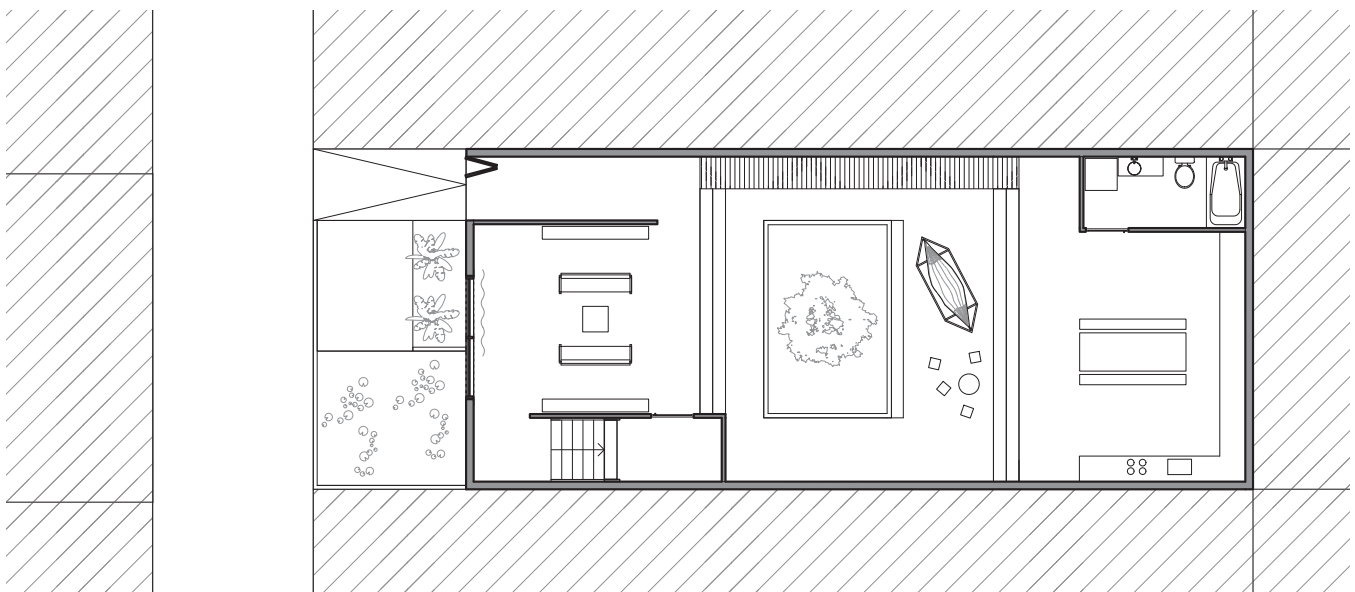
Plan of a new flood-adaptive alleyway house in dry condition.
